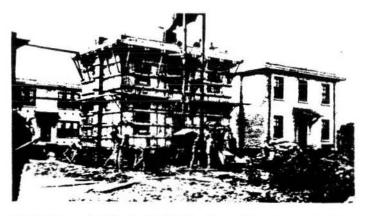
Thomas A. Edison's Cast-in-Place Houses, Union Township, New Jersey (1909). This construction photo shows the formwork for the cast-inplace reinforced concrete houses built as low-cost housing using a standard 25- by 30-foot module. Photo: Edison National Historical Site.
